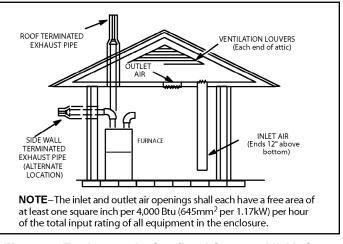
Equipment in Confined Space - All Air from Outside (All Air through Ventilated Attic)
